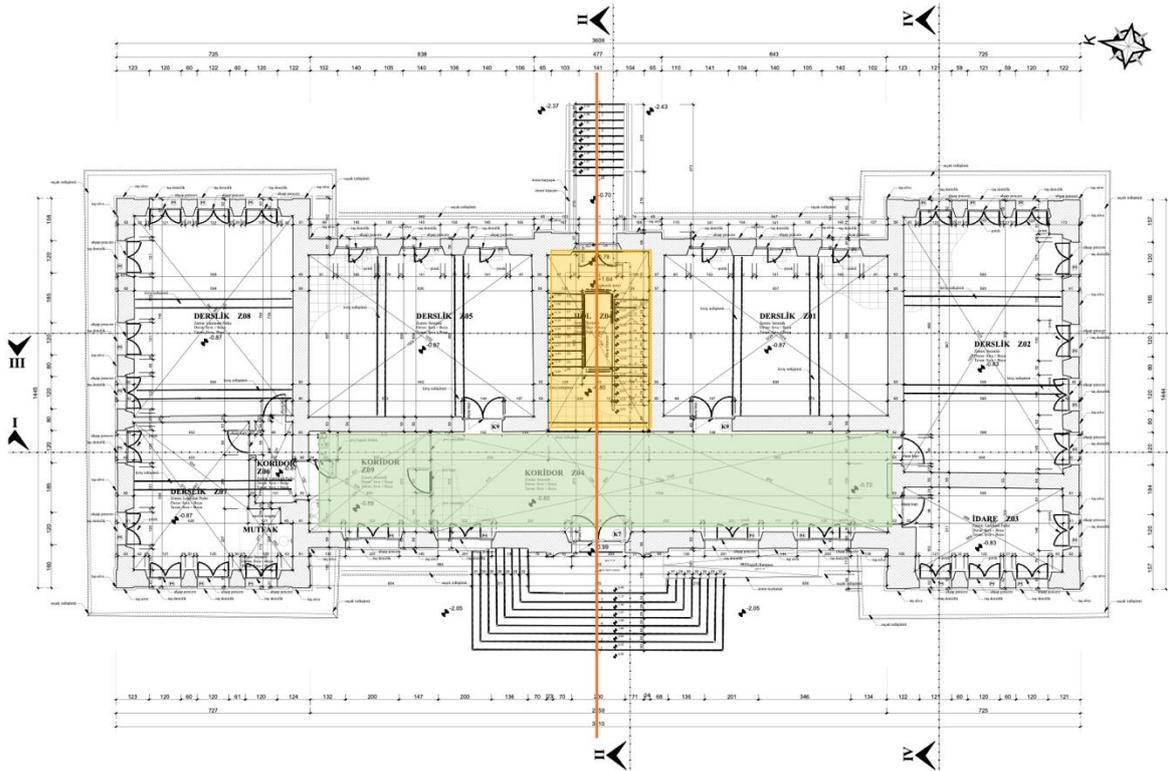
İsmet Paşa Primary School ground floor plan [18].
